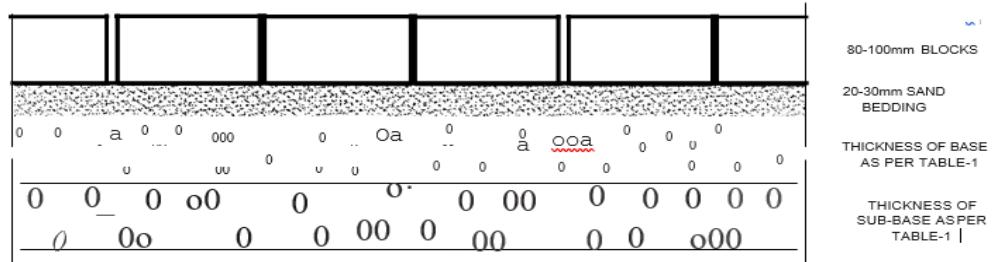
A typical cross section of block pavement for heavily trafficked roads
